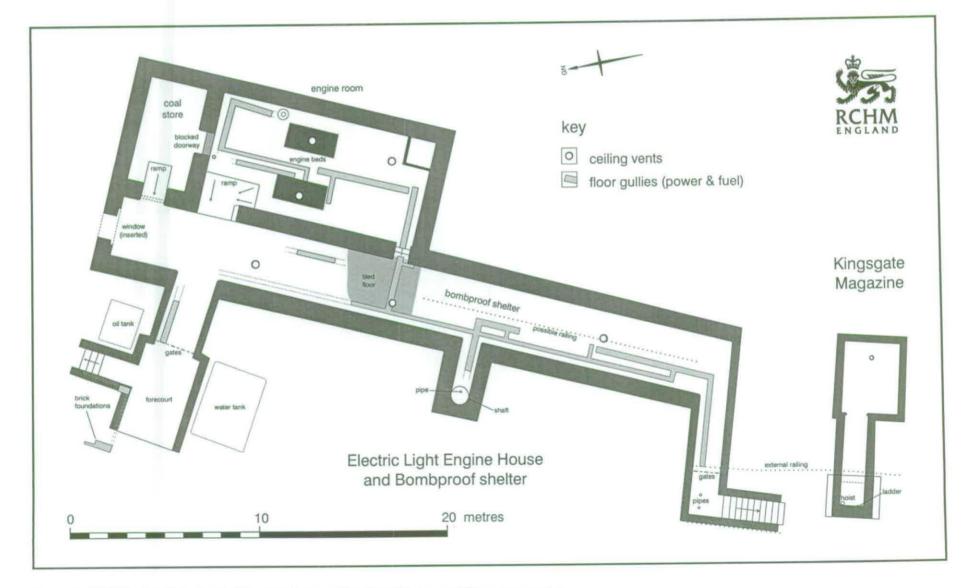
RCHME plan of the electric light engine house and bombproof shelter, and Kingsgate magazine
